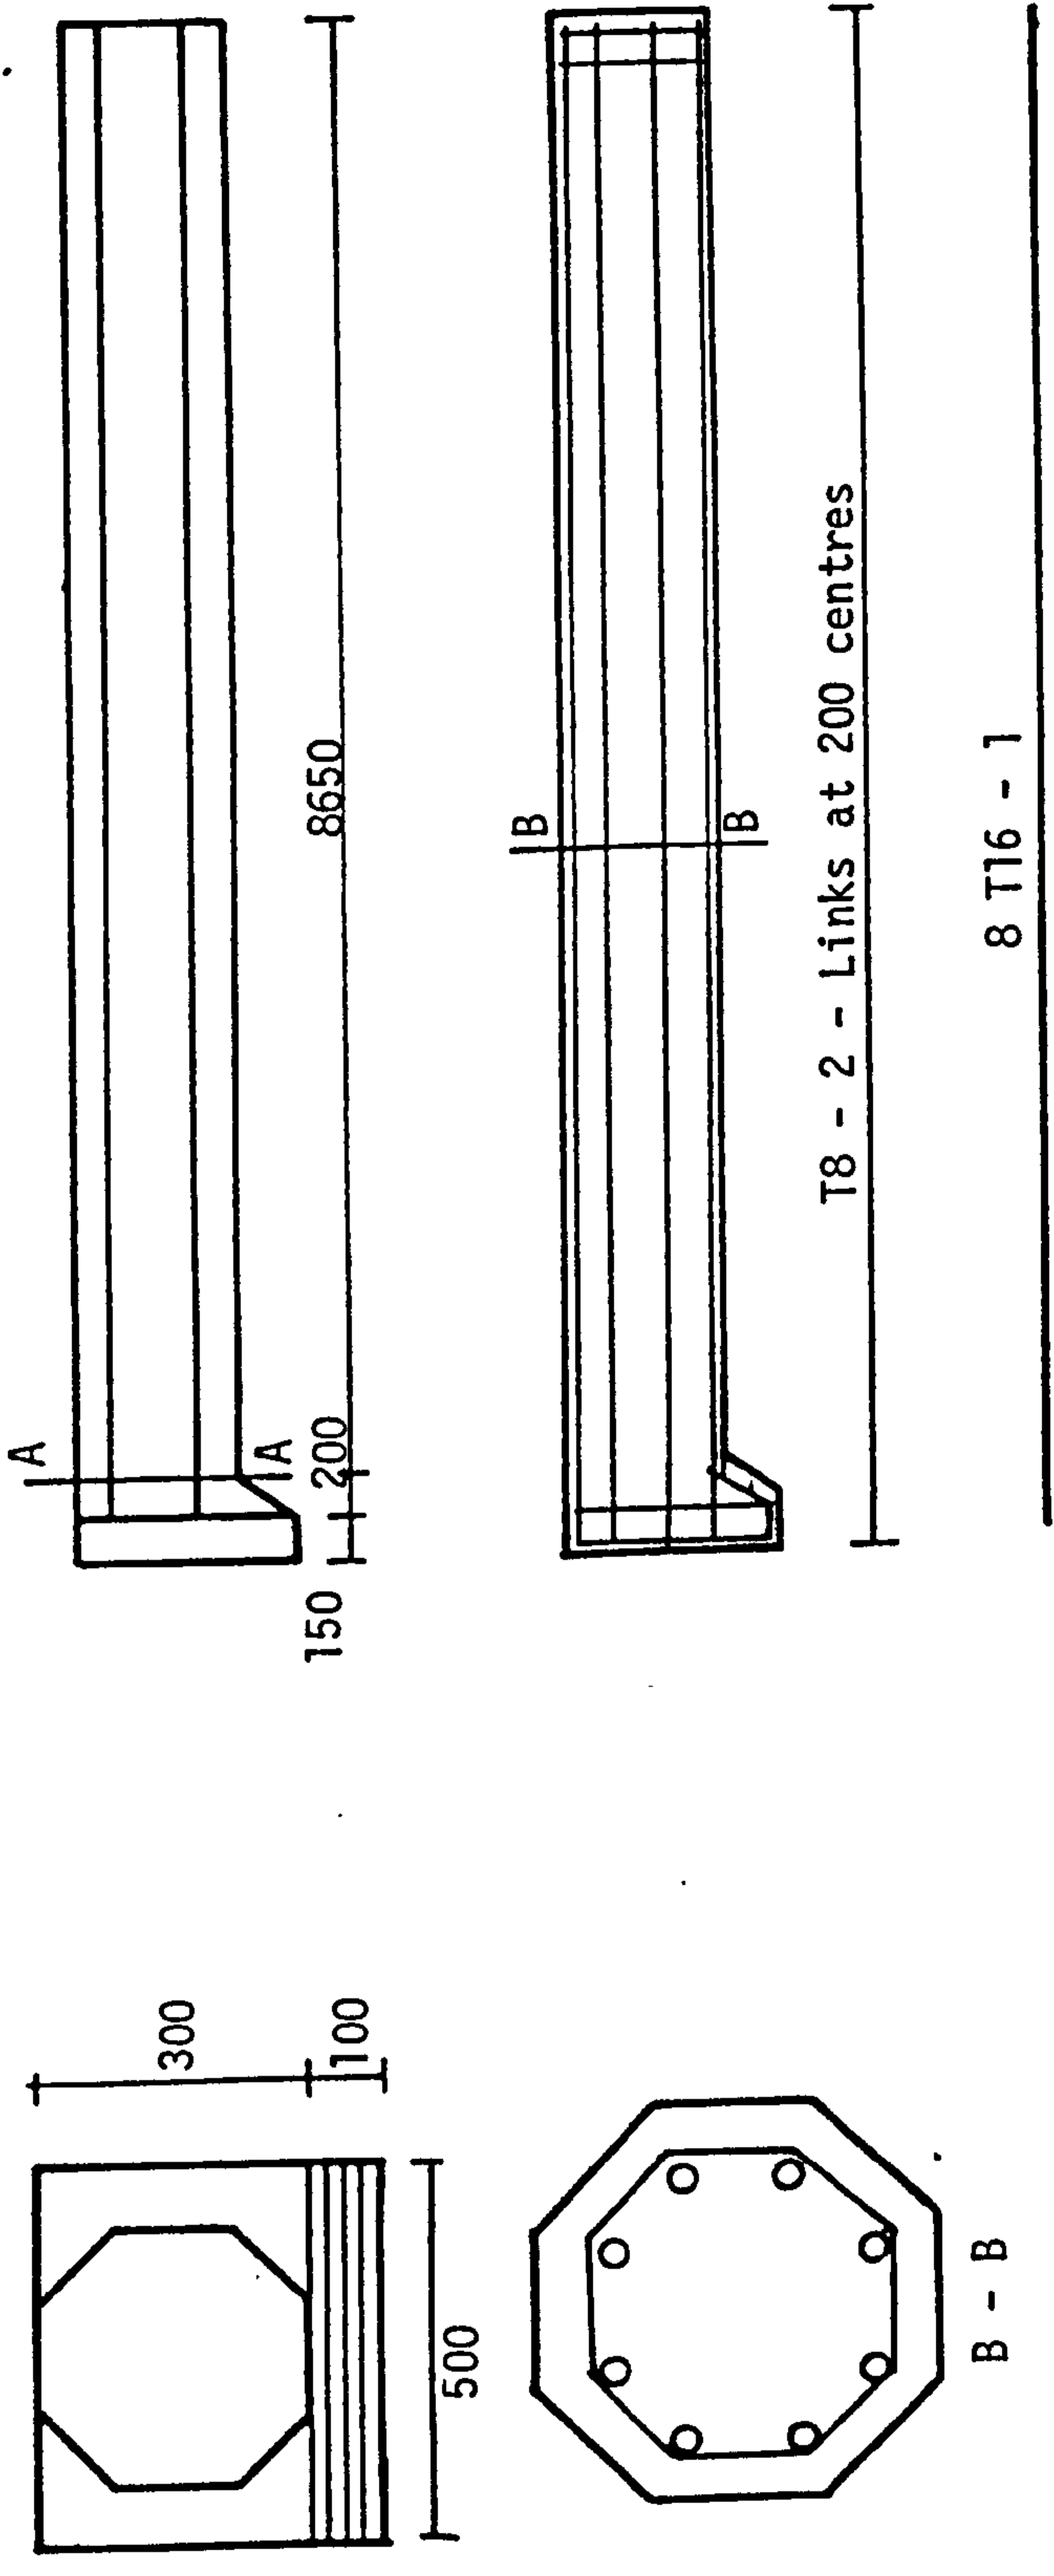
REINFORCEMENT DETAILS AND CROSS SECTION OF OCTAGONAL COLUMNS
